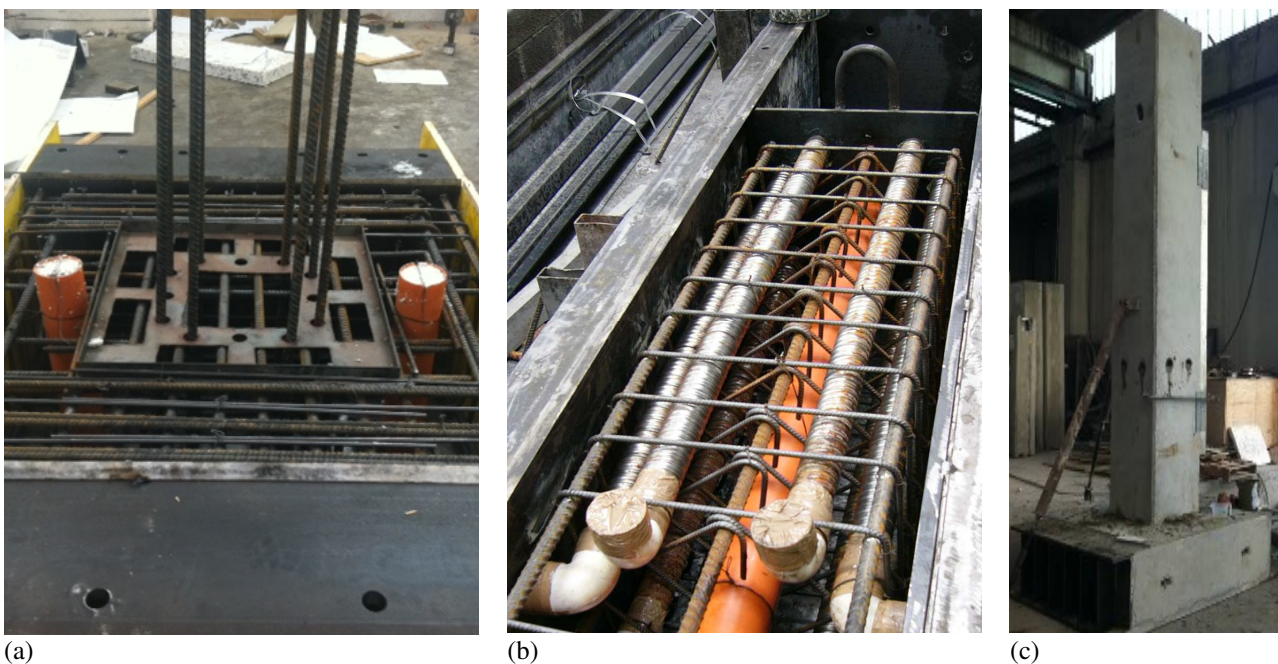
Reinforcement cages of (a) foundation, with the eight projecting bars, and (b) column, with the corresponding corrugated steel sleeves; (c) assembled specimen with the sleeves just grouted
